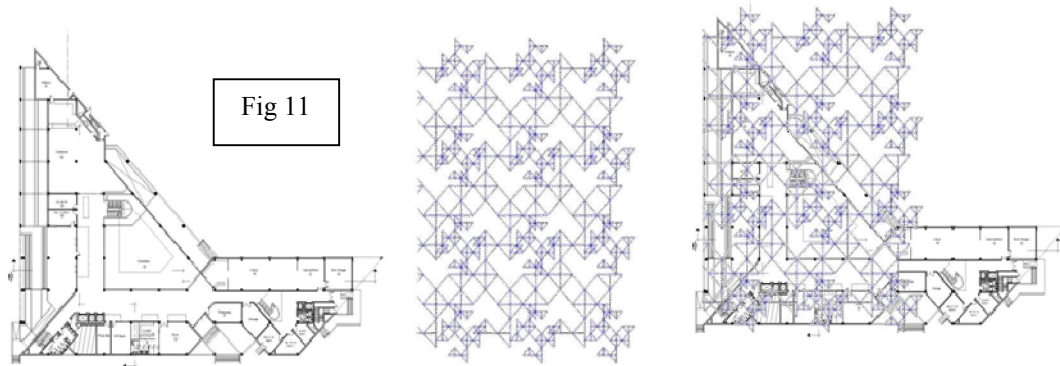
shows the hotel hall ground floor Plan-, the concept grid, the Installation process and the plan with the designed grid – in this stage of interior design
